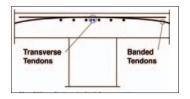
Recommended rebar and tendon layout at columns uses No. 4 bars for top steel reinforcement to match the 1/2-inch tendon diameter.
